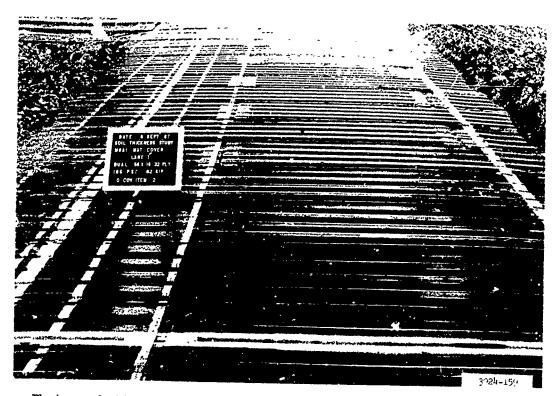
Test section I, lane 2, item 3, after failure at 924 coverages of mixed traffic
